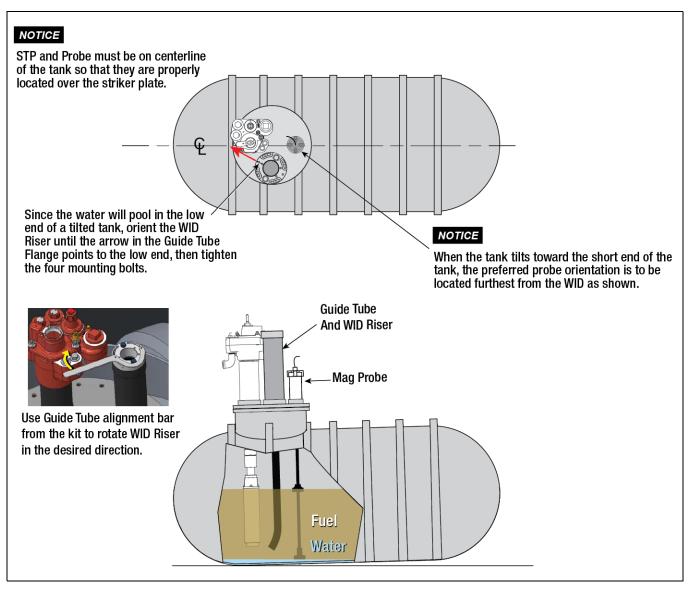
Guide Tube Installation Example - Tank tilting toward short end of the tank
